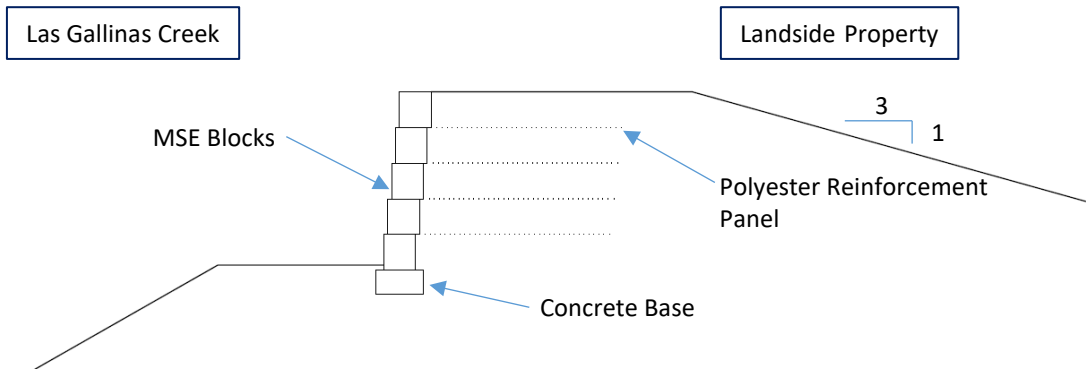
Mechanically Stabilized Earth Wall Cross Section
